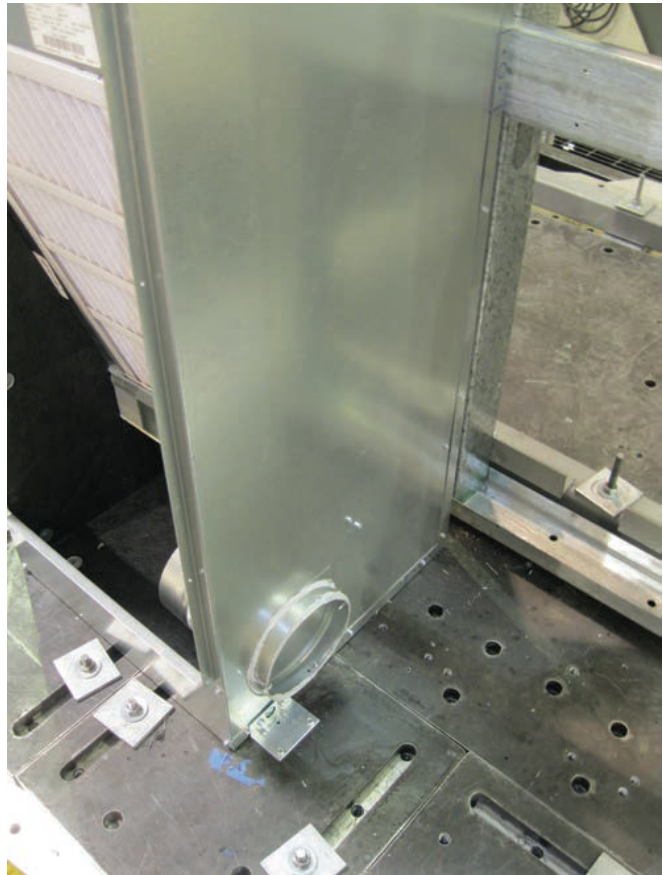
MANUFACTURER-SUPPLIED ANGLE CLIP
